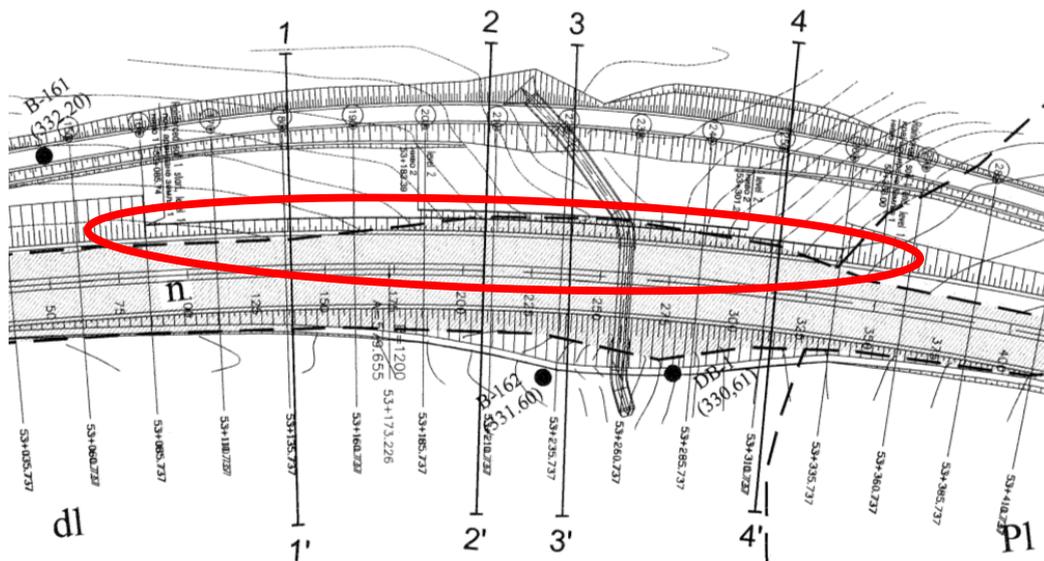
The position of the retaining structure of reinforced earth in the layout plan of the route
